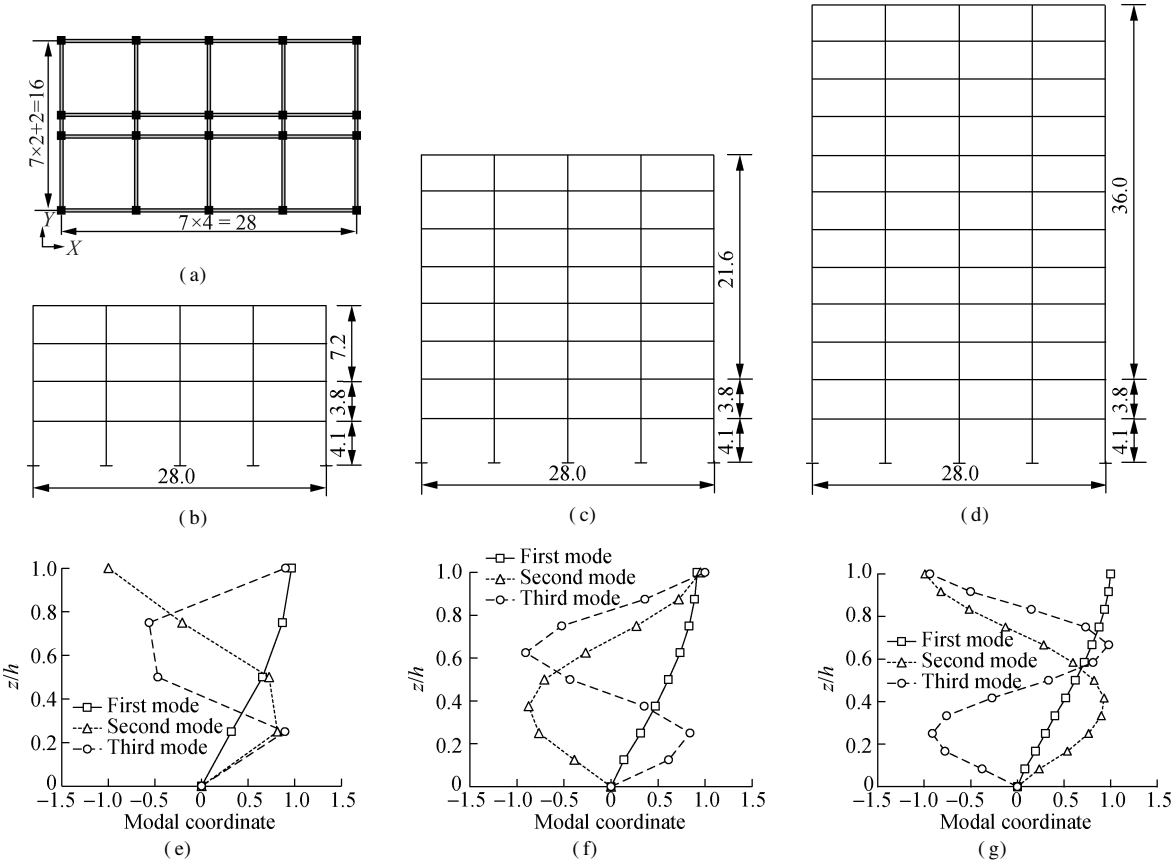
Supporting structure. (a) Layout of the prototype frames (unit: m); (b) Lateral view of the four-story frame (unit: m); (c) Lateral view of the eight-story frame (unit: m); (d) Lateral view of the twelve-story frame (unit: m); (e) Modal shape of the four-story frame; (f) Modal shape of the eight-story frame; (g) Modal shape of the twelve-story frame
